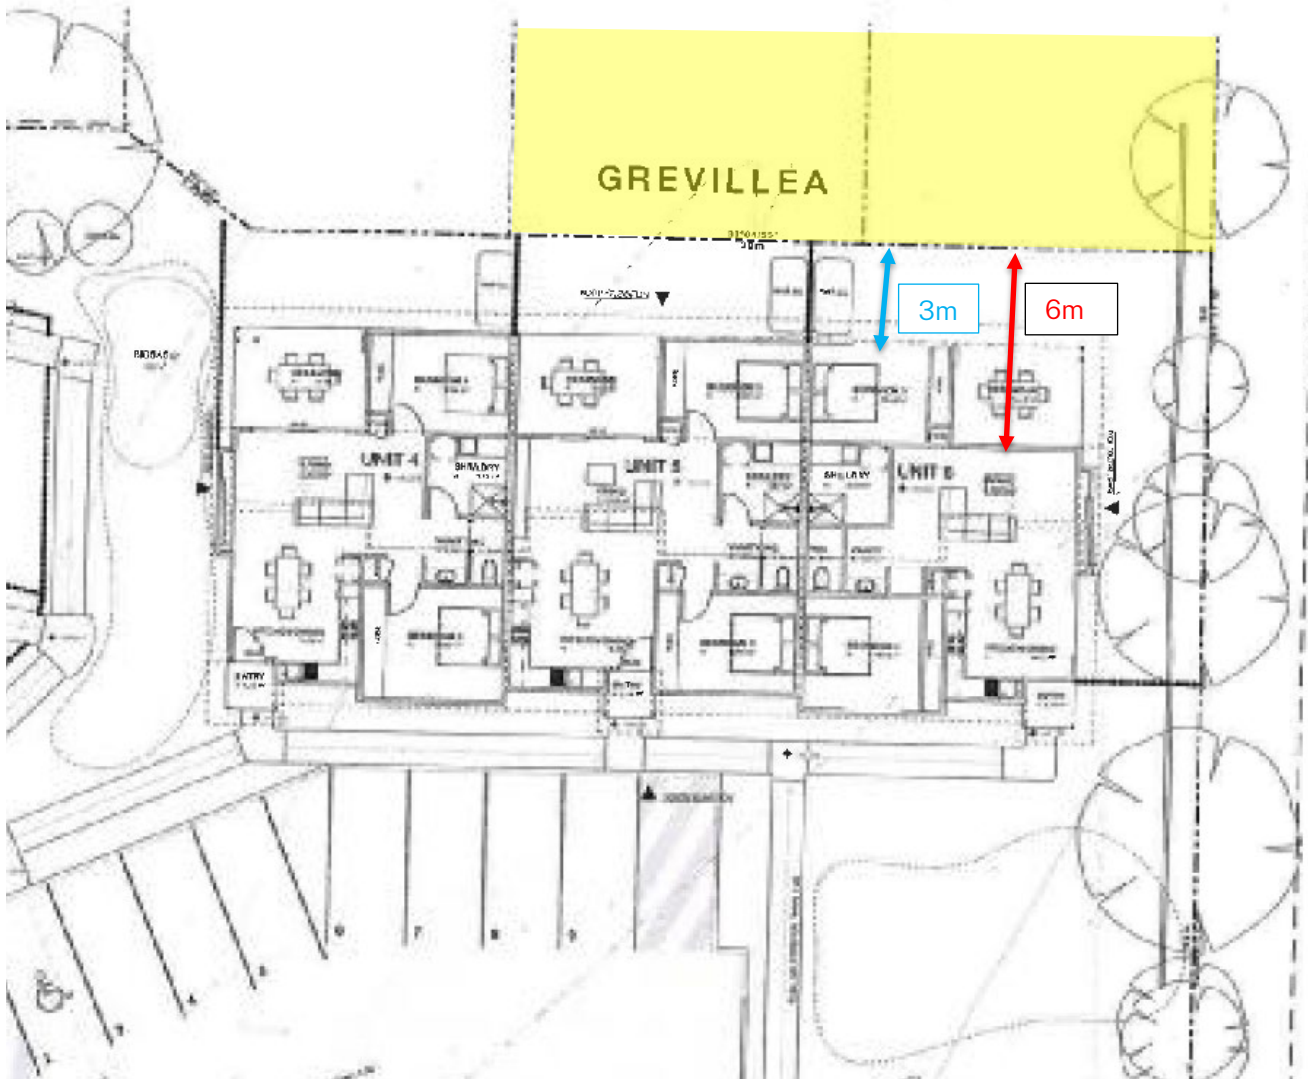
Extract of approved floor plan for single storey dwellings closest to the shared boundary (75-77 Sheppard Street shaded yellow) (source: DA2021/0226).
